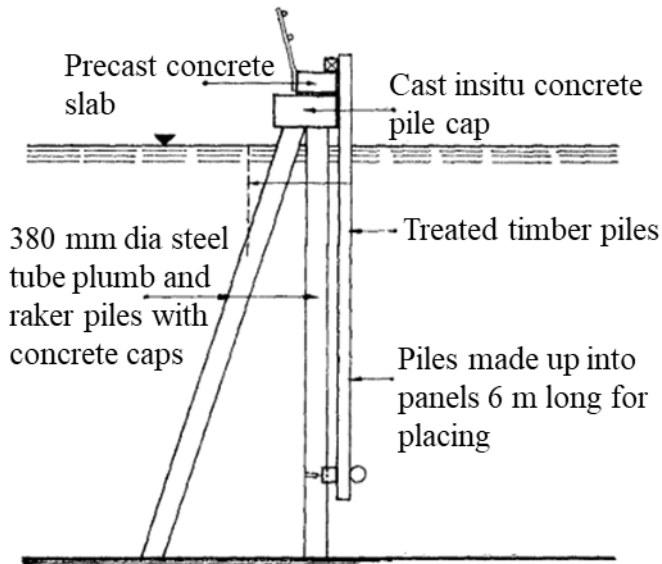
Typical cross section of the pile breakwater built at Half Moon Bay Marina Auckland, New Zealand (Hutchinson and Raudkivi 1984)
